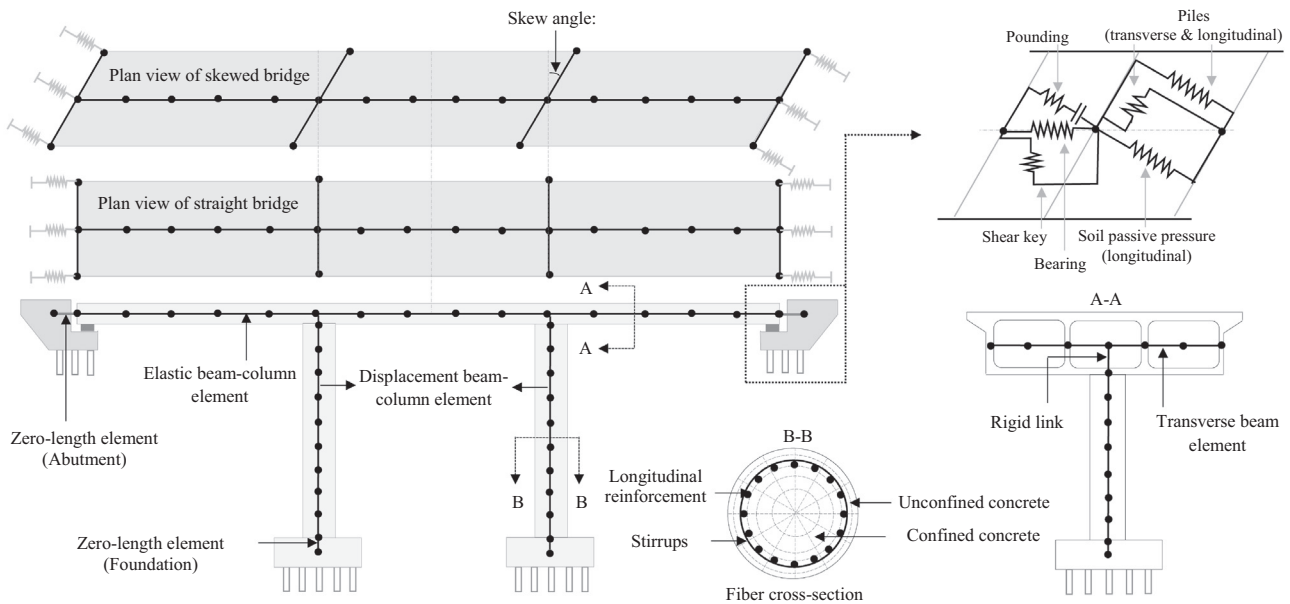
Typical layout of a single-frame, three-span, box-girder bridge.
